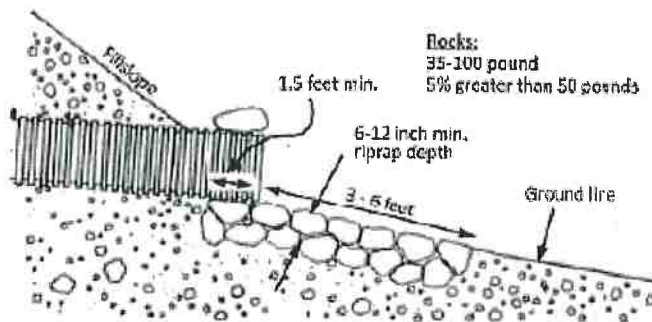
A. Riprap armor at culvert outlet (Modified from: Keller et al., 2011).
